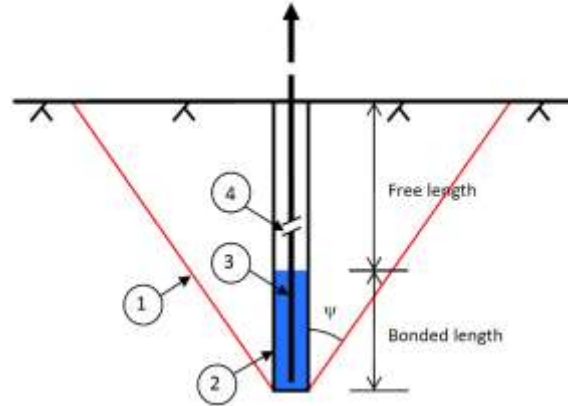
Grouted rock anchors can in principle fail in four ways: (1) rock mass uplift failure; (2) grout-rock bond or interface failure; (3) tendon-grout bond or interface failure; and (4) steel tendon tensile failure.
